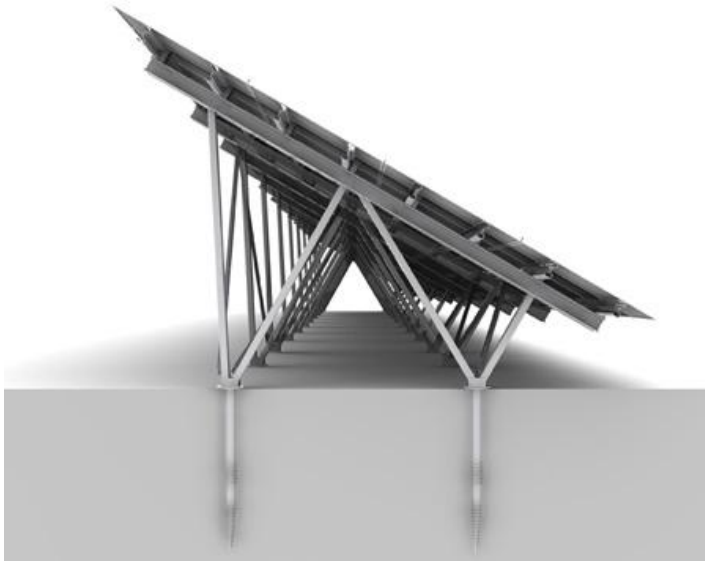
Typical rammed or screwed method with fixed frame (Source: Solek Layout Report, 2012).
